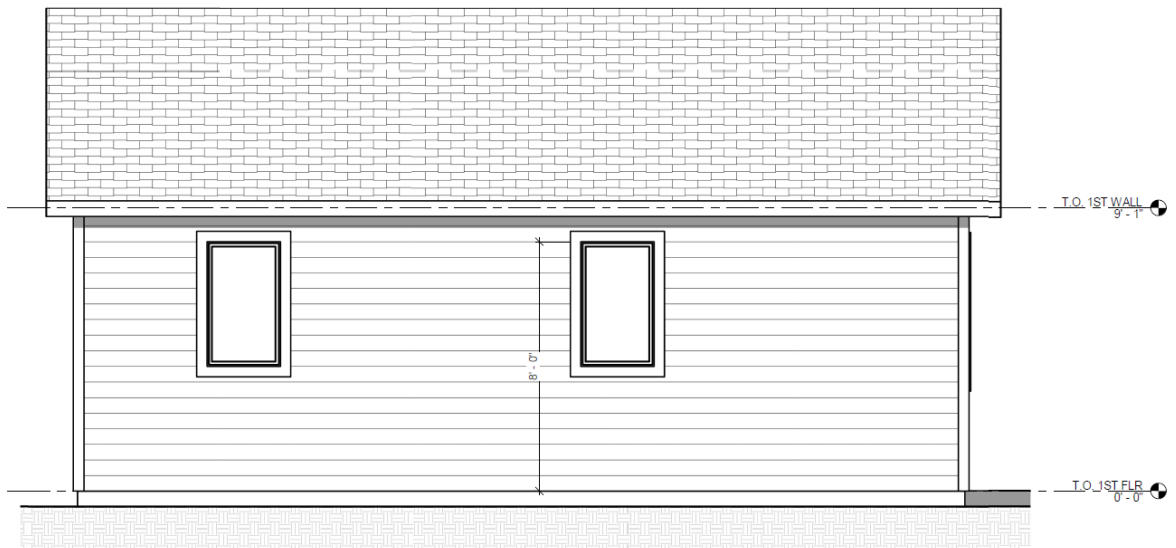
Preliminary Elevation Plan of Detached ARDU – Left, Prepared by Groen Design
